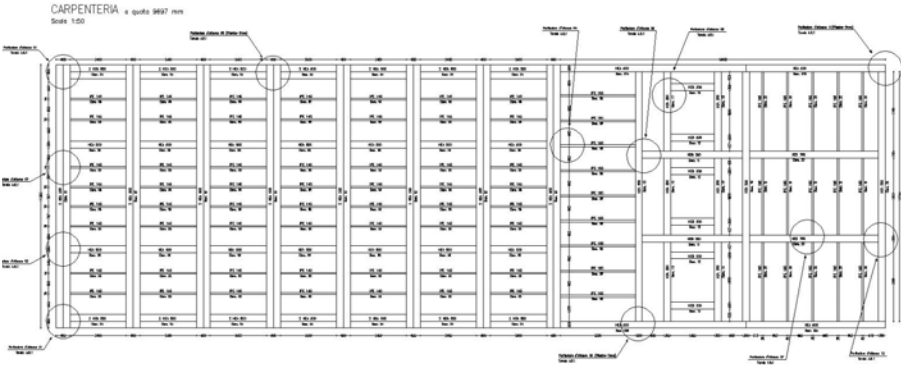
Plan view of the steel frame service structure inside the hall B
